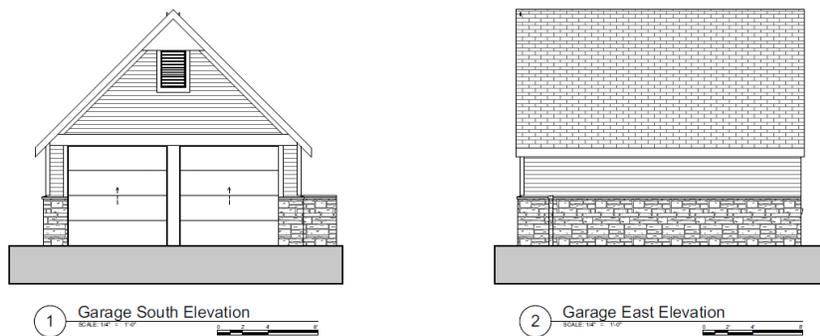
Proposed Garage South (alley) and East (side) Elevations.
